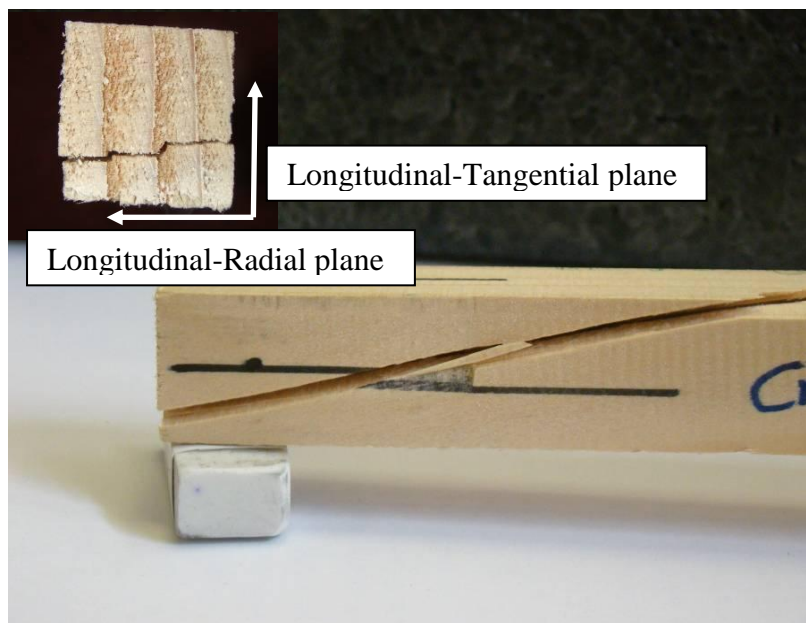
Front and cross-sectional of view of a typical crushing failure of clear wood specimen.
